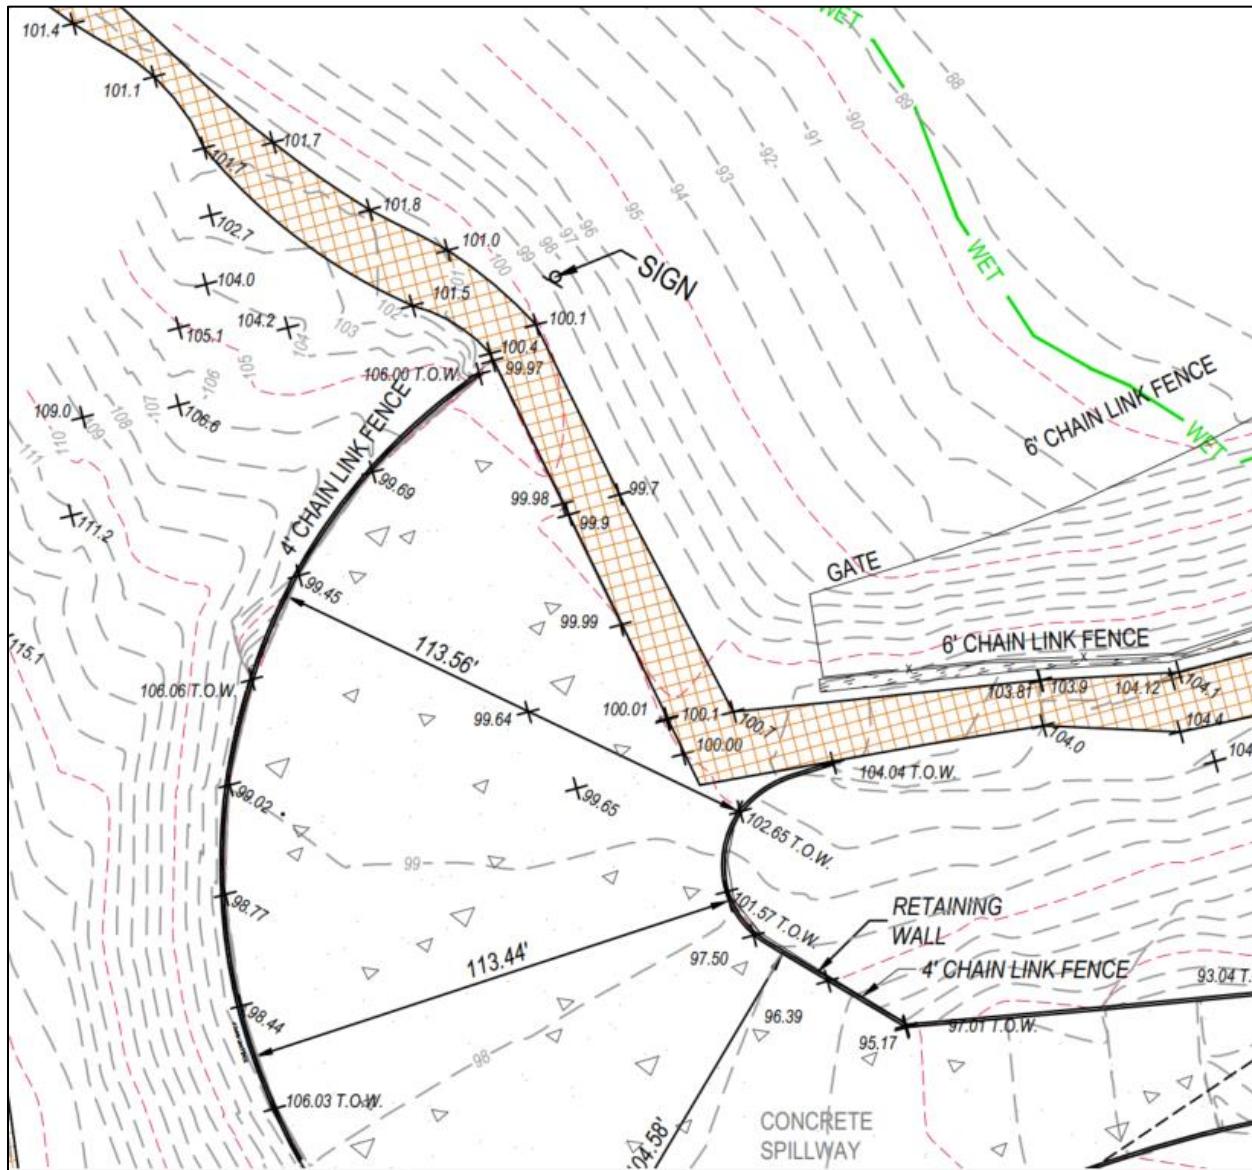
As-built Survey of the Dove Pond Dam Spillway
